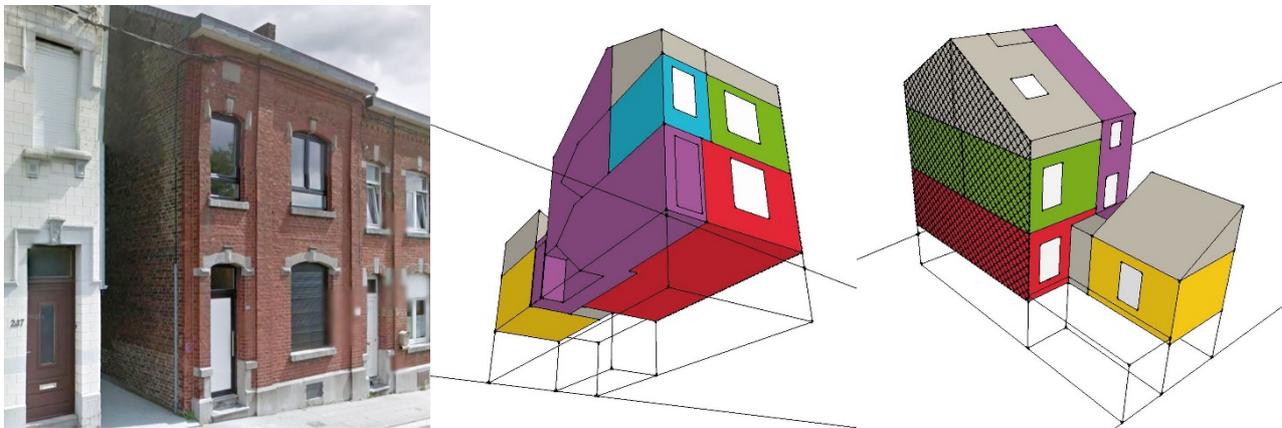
CS7 – Left: street facade; centre: low-angle shot of the North (alleyway) and West (street) facades; right: high-angle shot of the South (shared) and East (garden) facades
